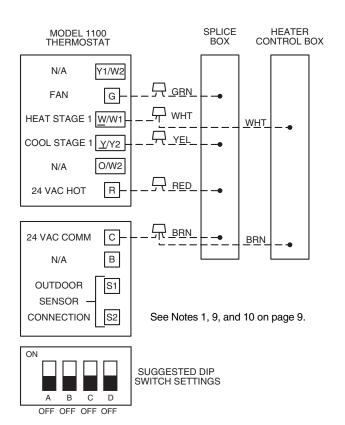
Single-Speed Packaged Air Conditioner with Single-Stage Electric Heat — Model 1100 Thermostat
